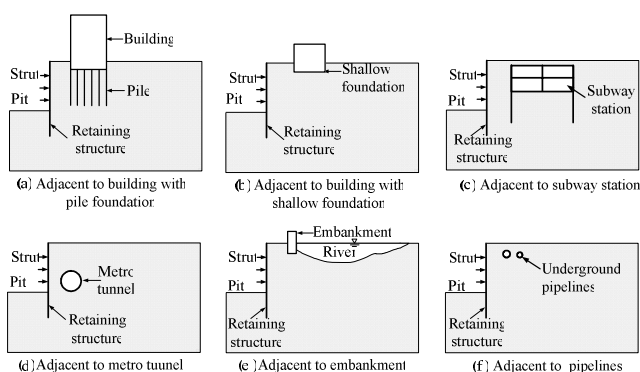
Sketch maps of typical situations of excavations adjacent to properties (Li et al, 2008)
